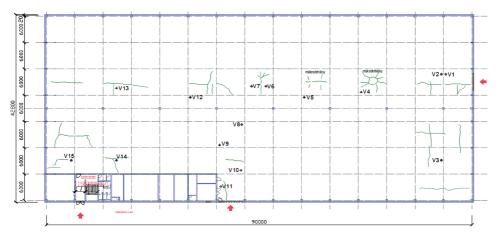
Scheme of cracks and sampling points of the industrial floor of the production hall in Ostrava-Vítkovice
